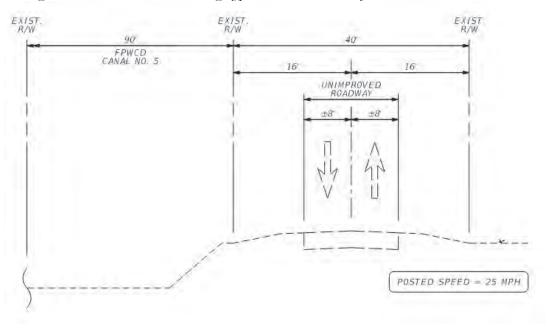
C: Seminole Road Existing Typical Section – North of Immokolee Road
